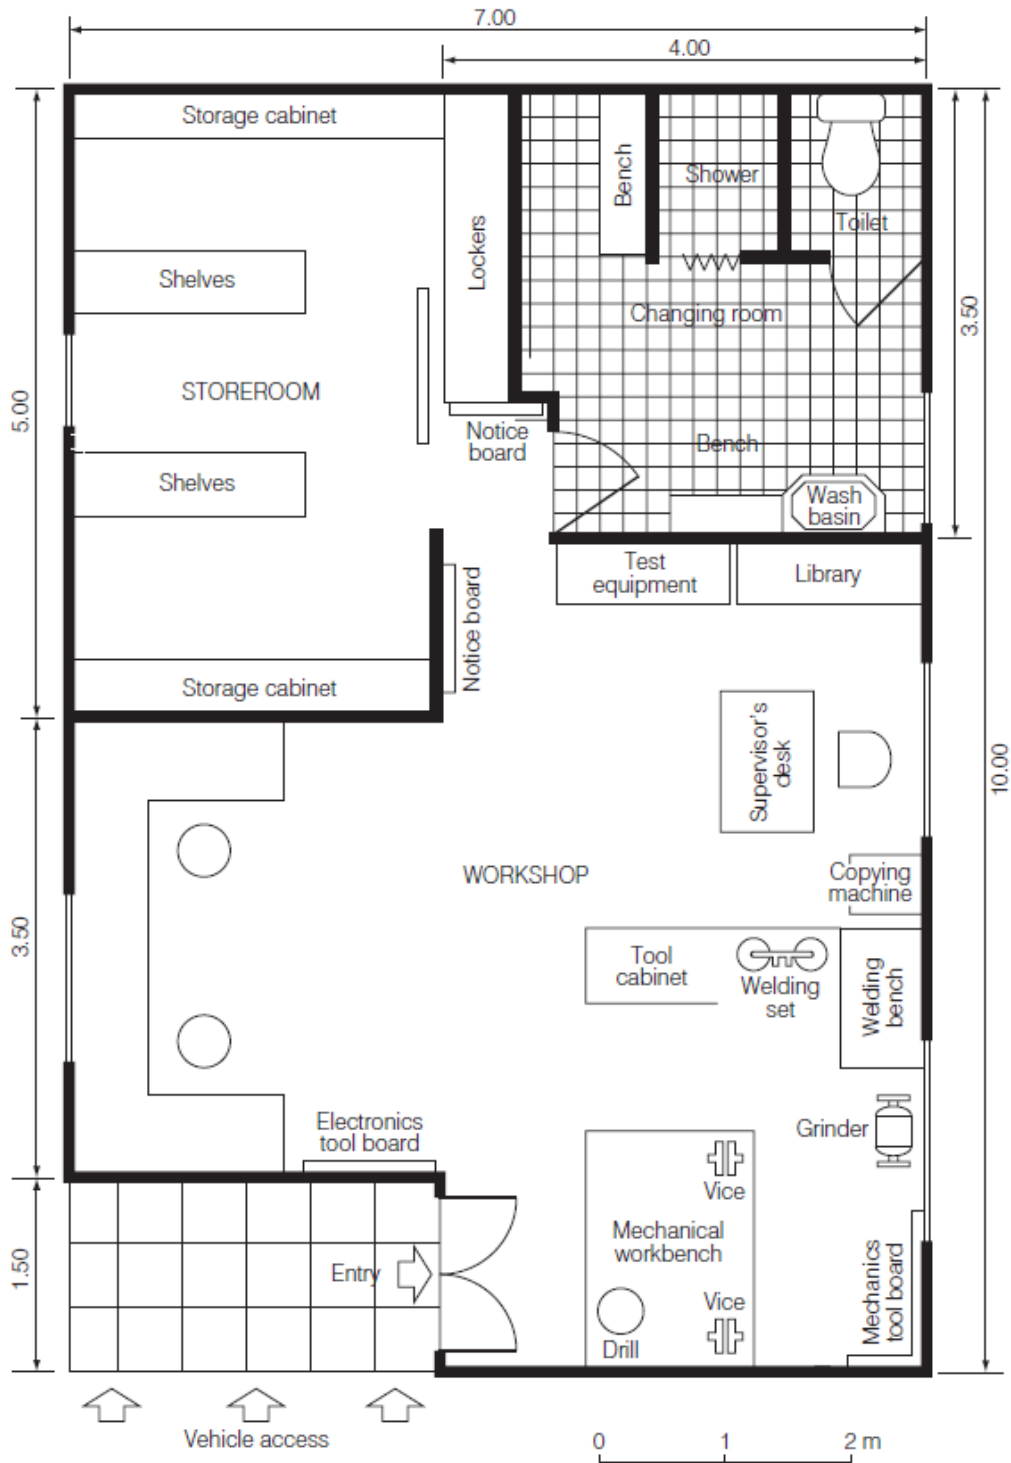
Typical Layout for a Workshop of a 100-Bed.
